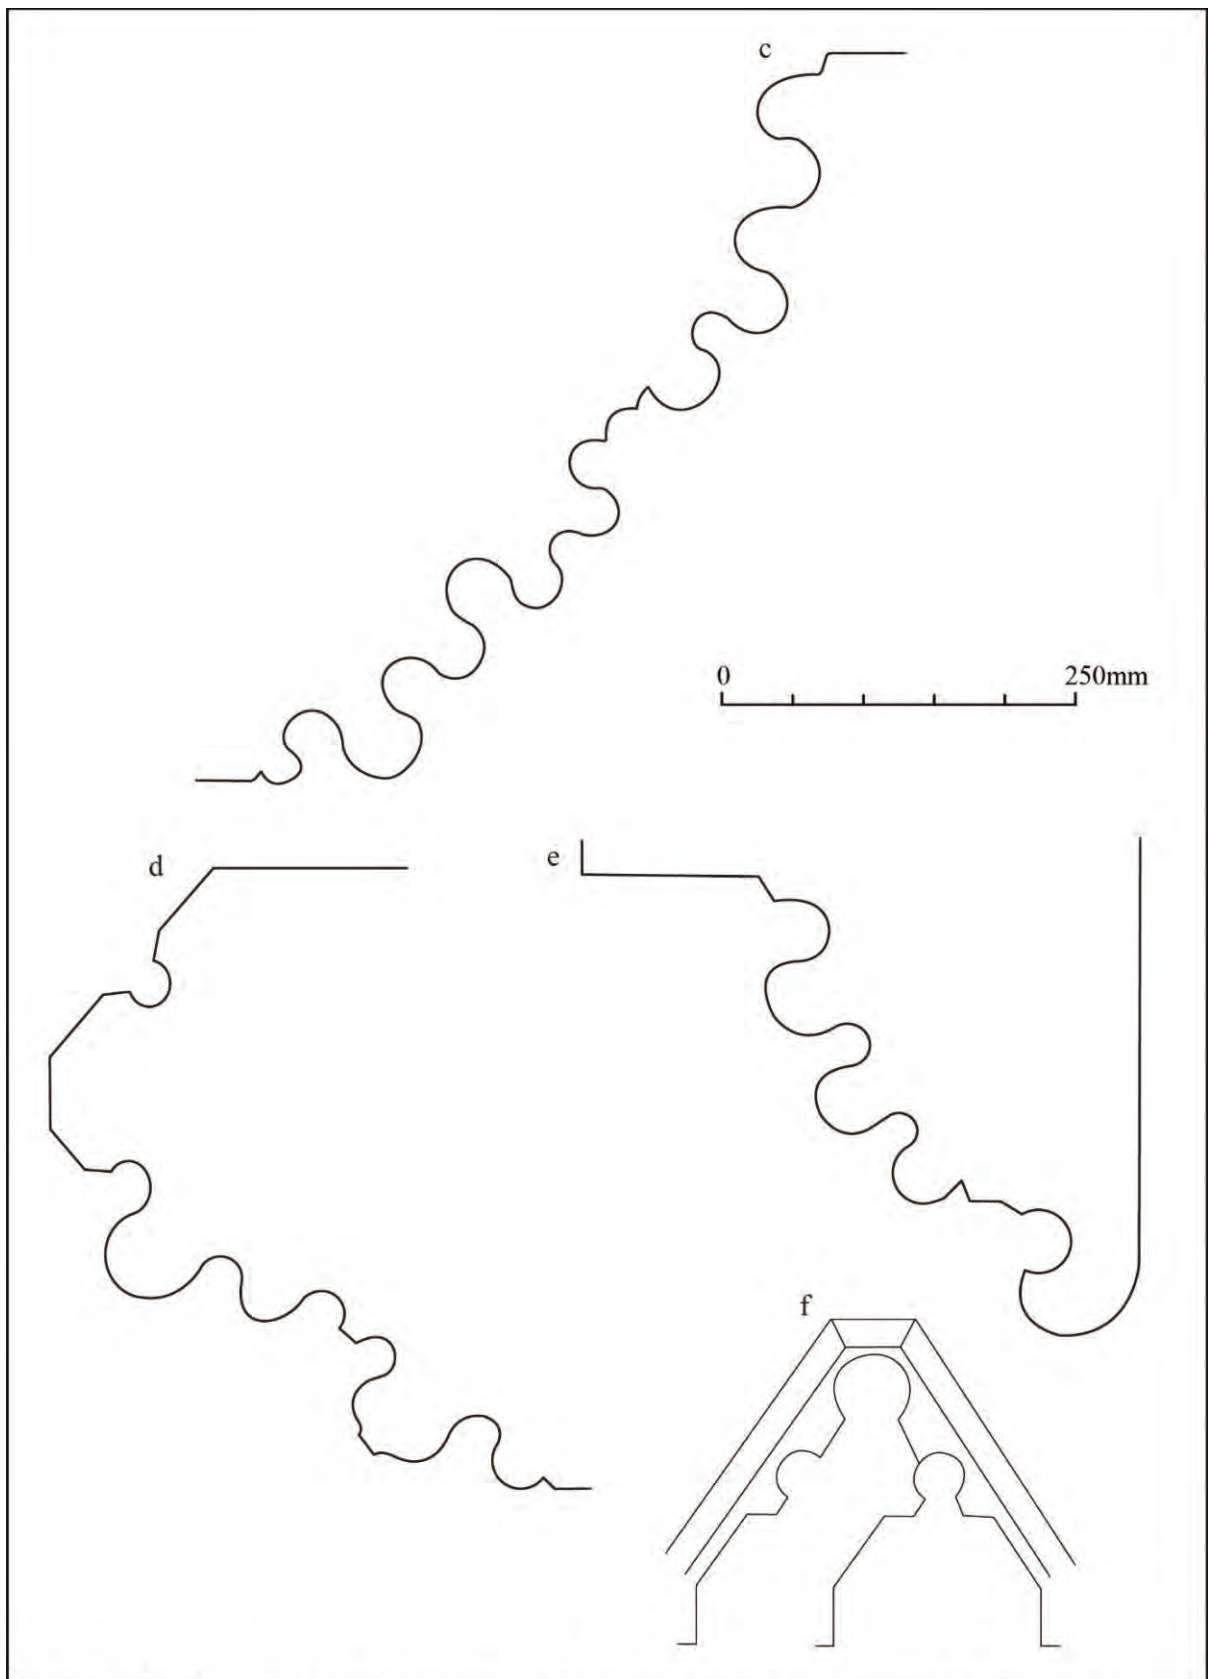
f. Moulding profiles. (c) North arcade, Bay 4. (d) South arcade Bay 4. (e) West doorway, hood mould. (f) Clerestory Bay 4, north window, common and king mullion (*J. Allan & A. Steinmetzer/D. Gould*).
